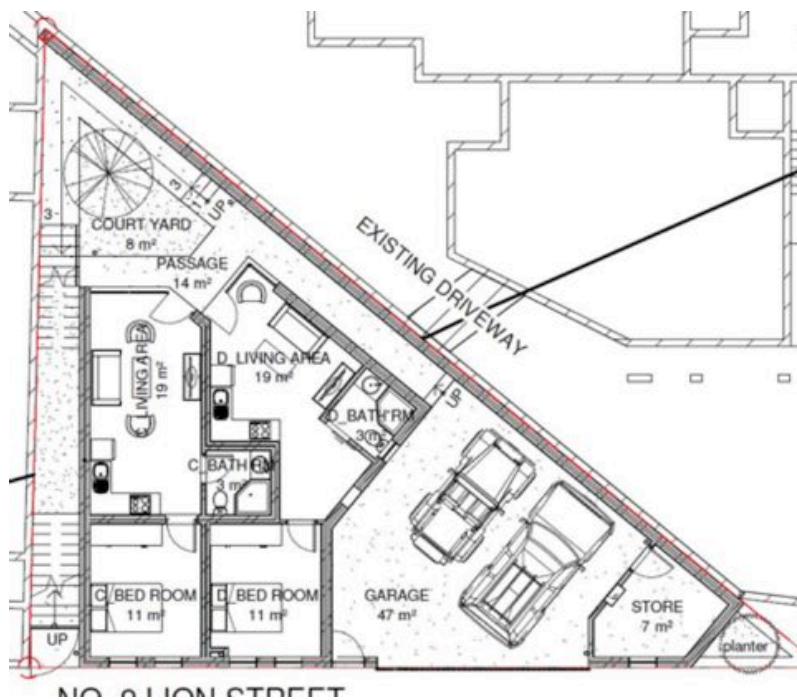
Ground plan of the building (Architectural Solutions Studio 2020).
